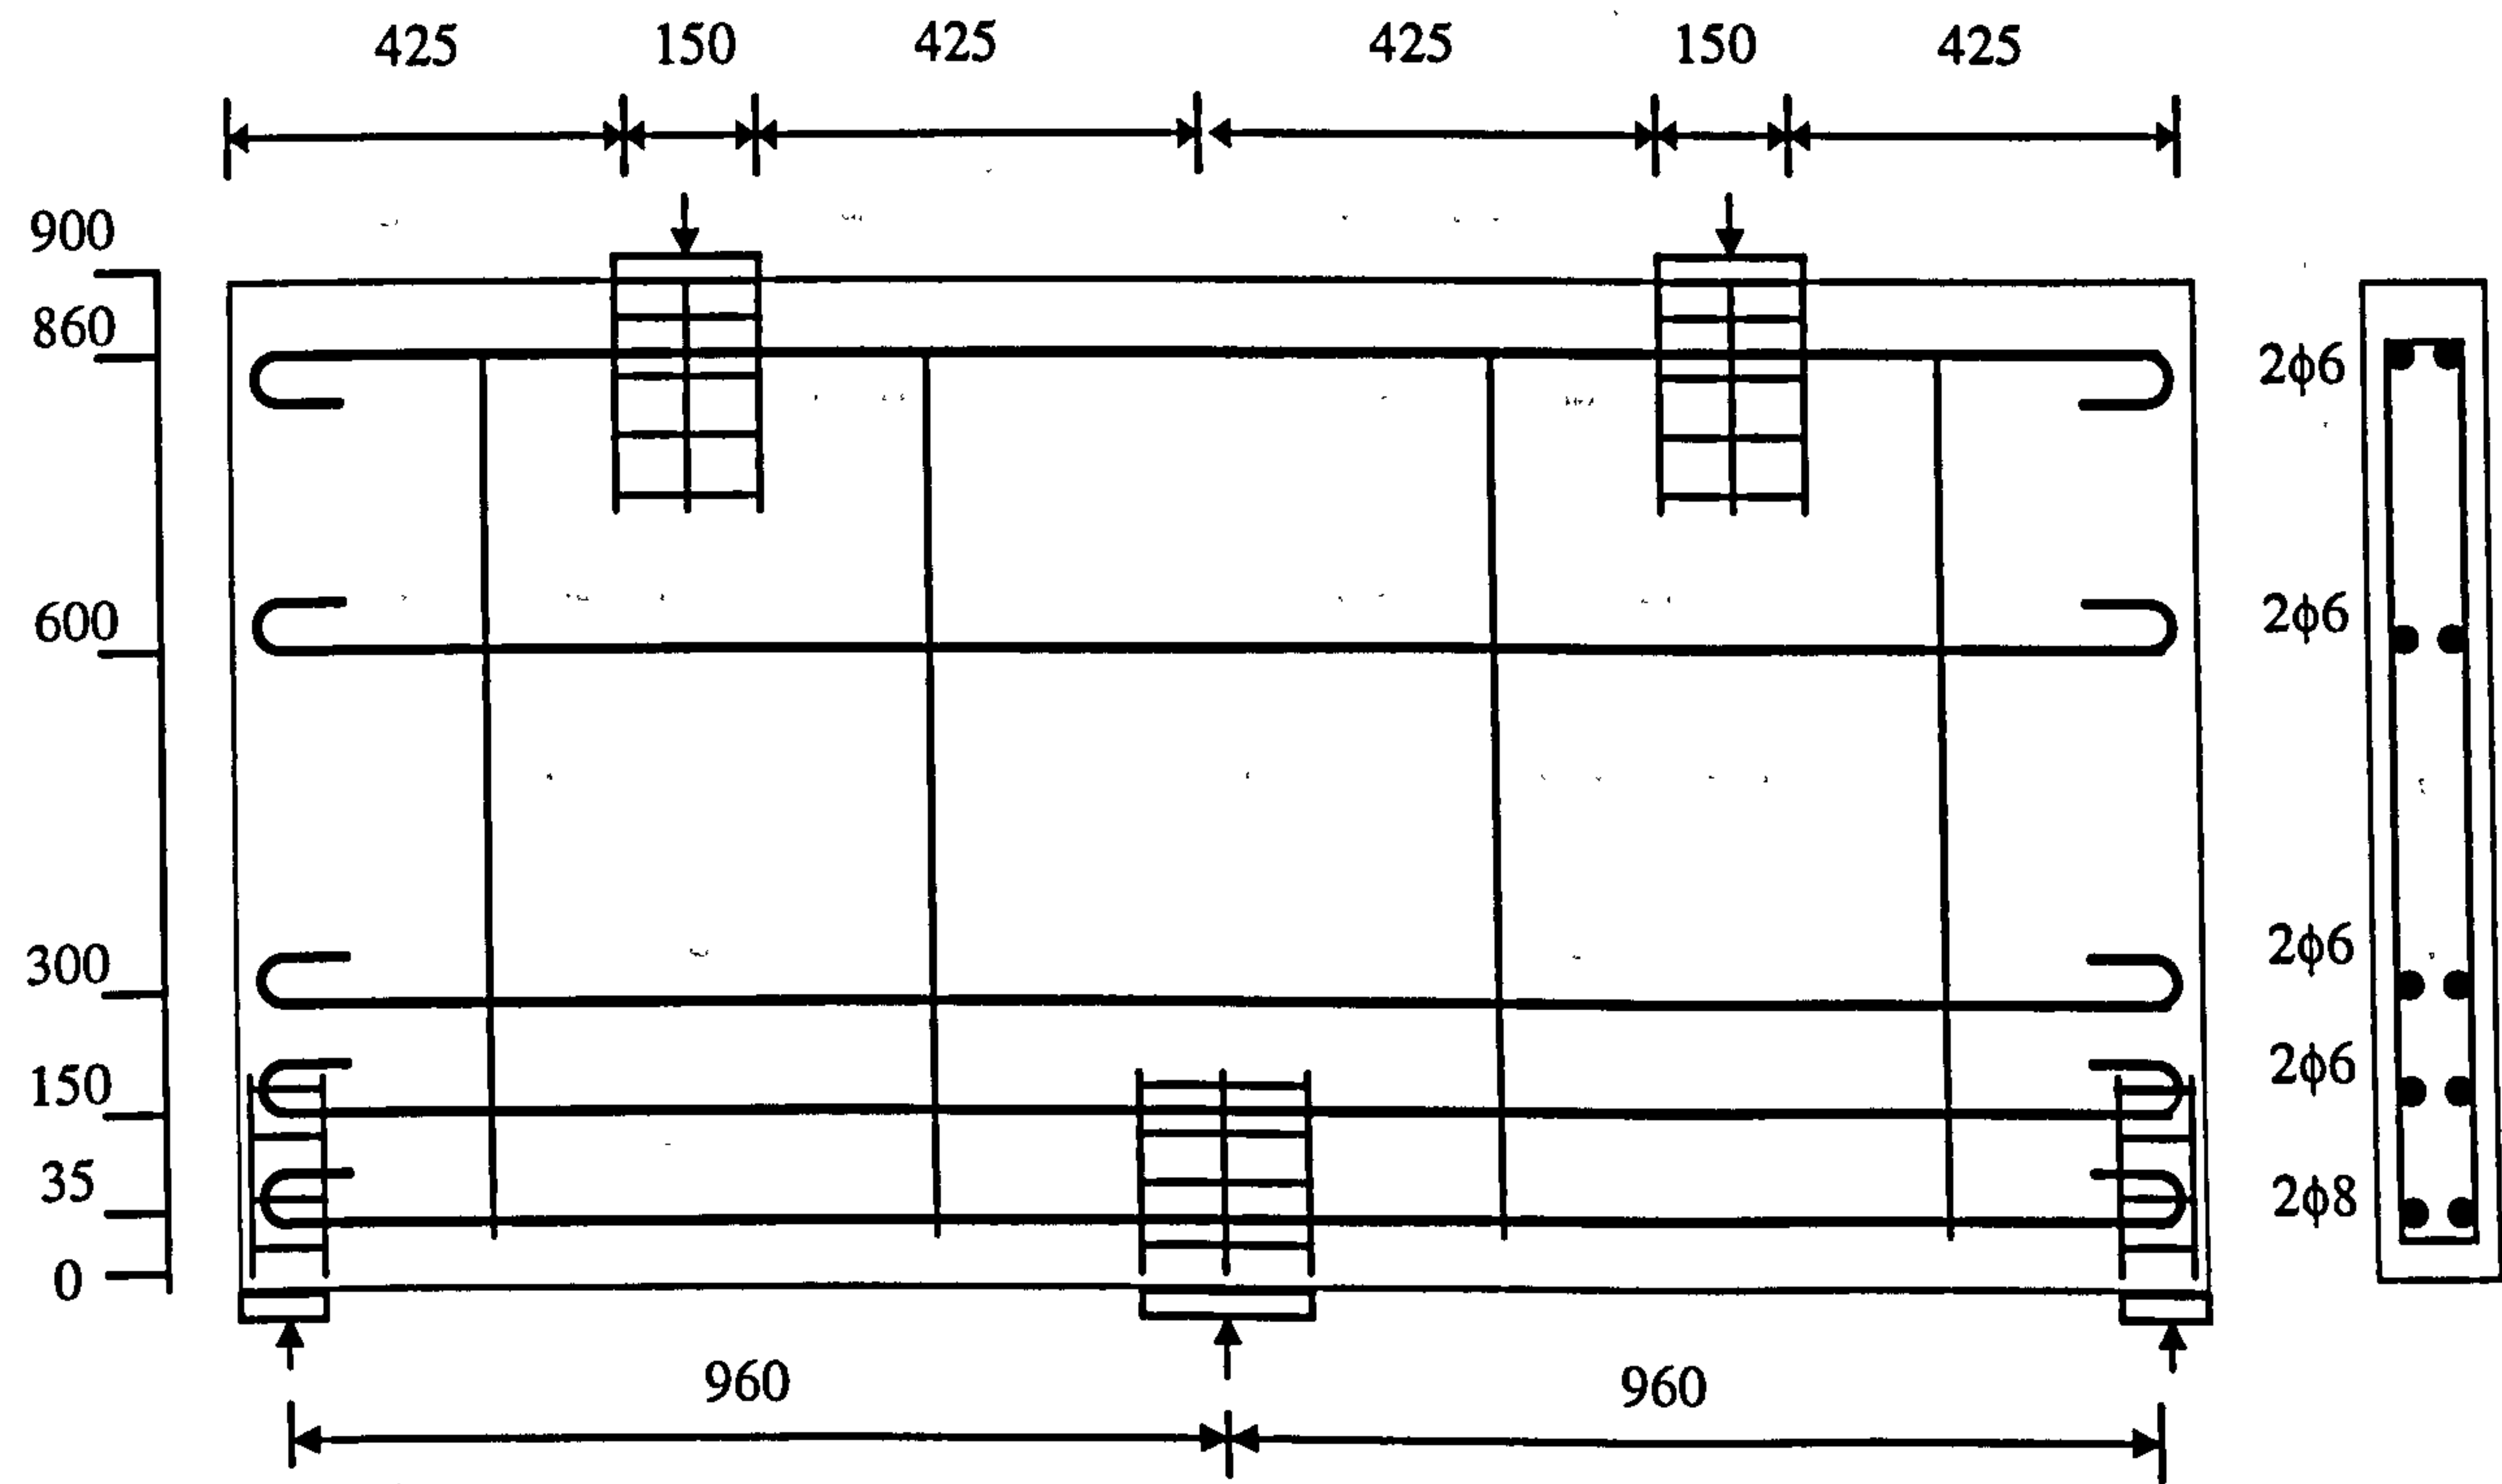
(b) Dimensions and reinforcement details for TGRAS2
